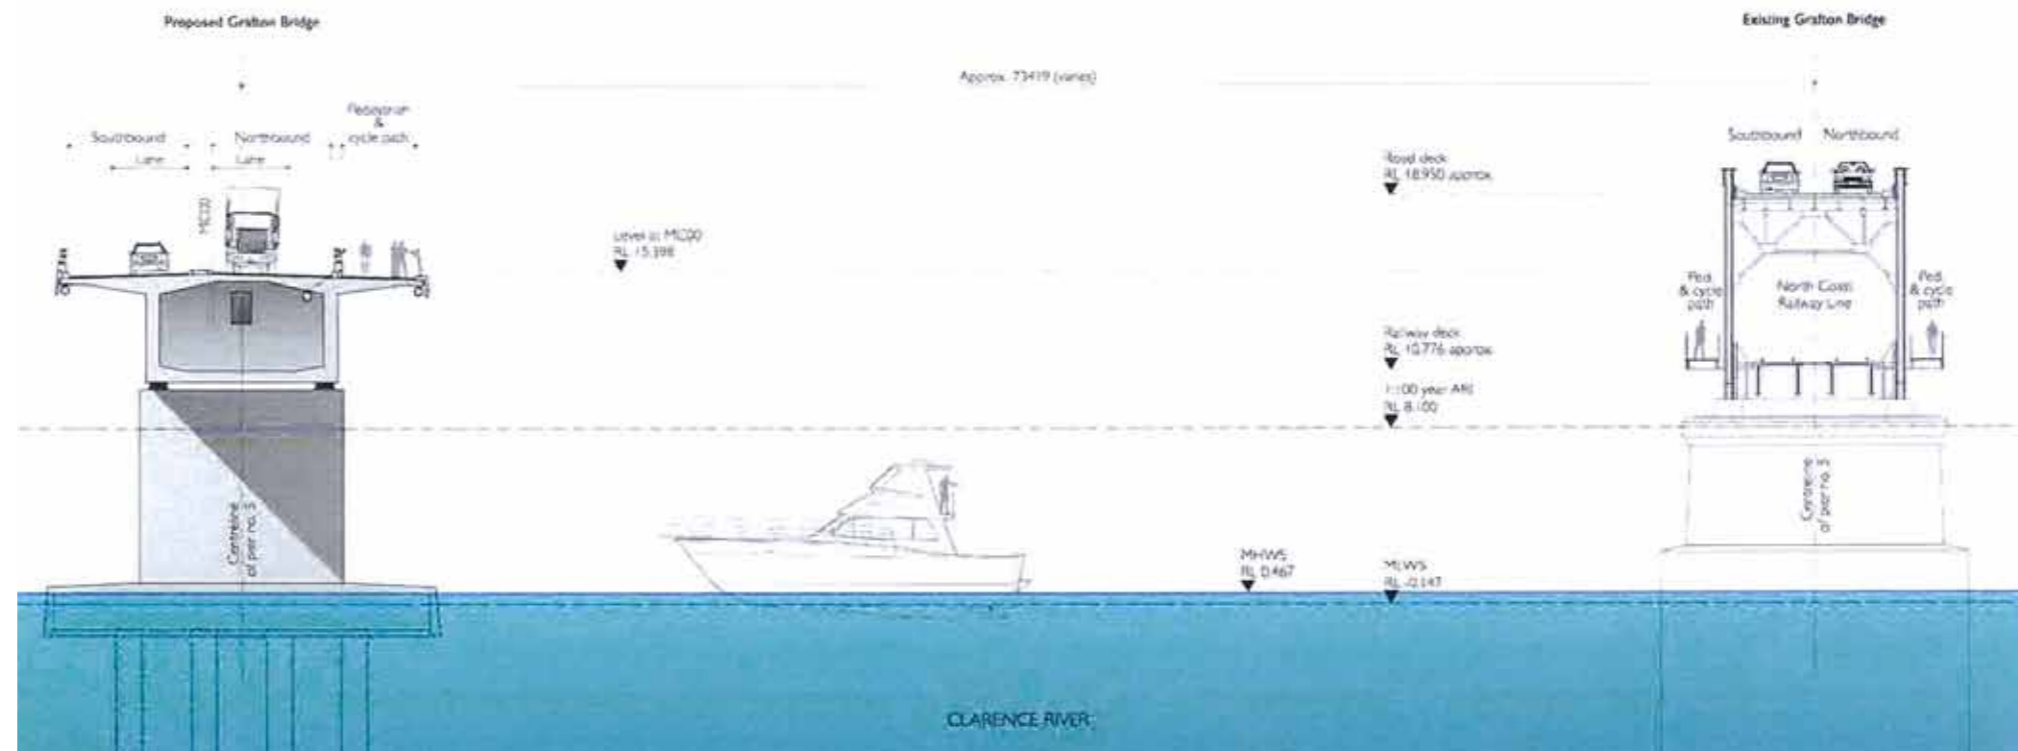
Relationship of new bridge to existing heritage listed bridge - EIS design
